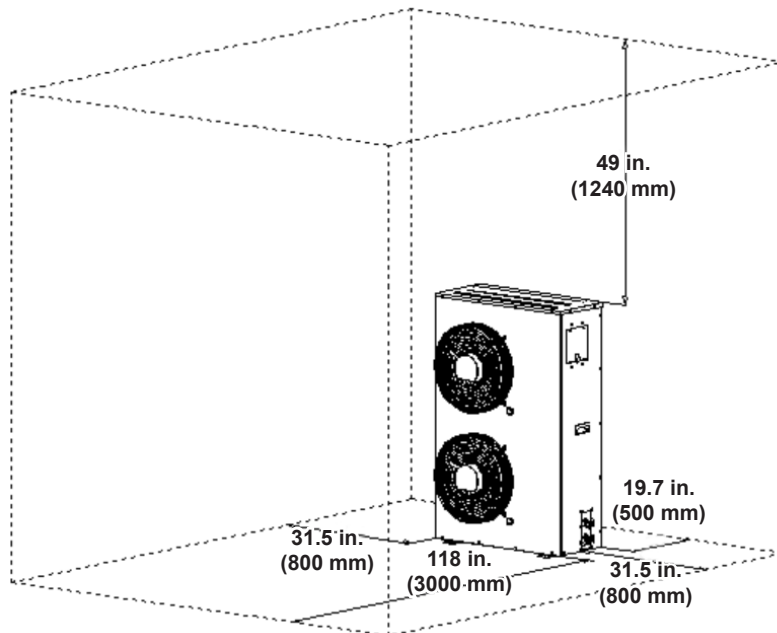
A: Installation Clearance Requirements - Condenser (SRCOOLDXRW12)
